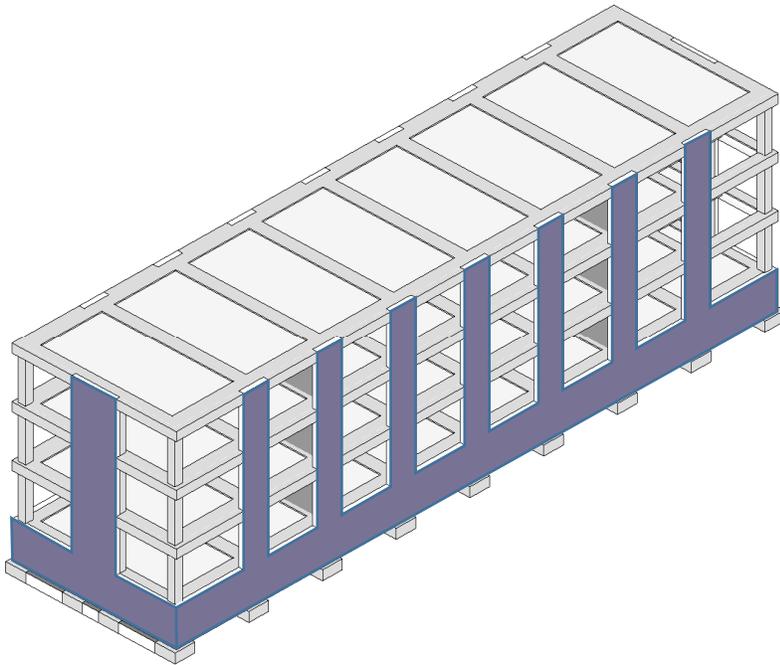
Retrofit showing new walls (in blue) added to the outside of the precast frame. The exterior panels are to be removed.
